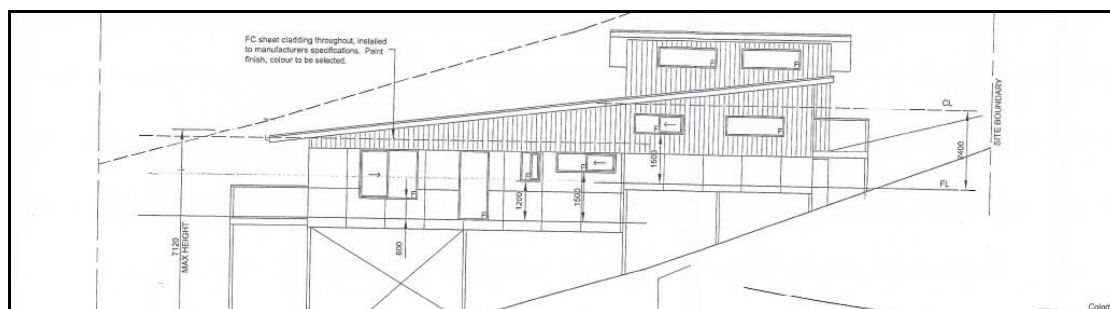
Proposal Plan – SW Elevation - Gary Reed Building Design
